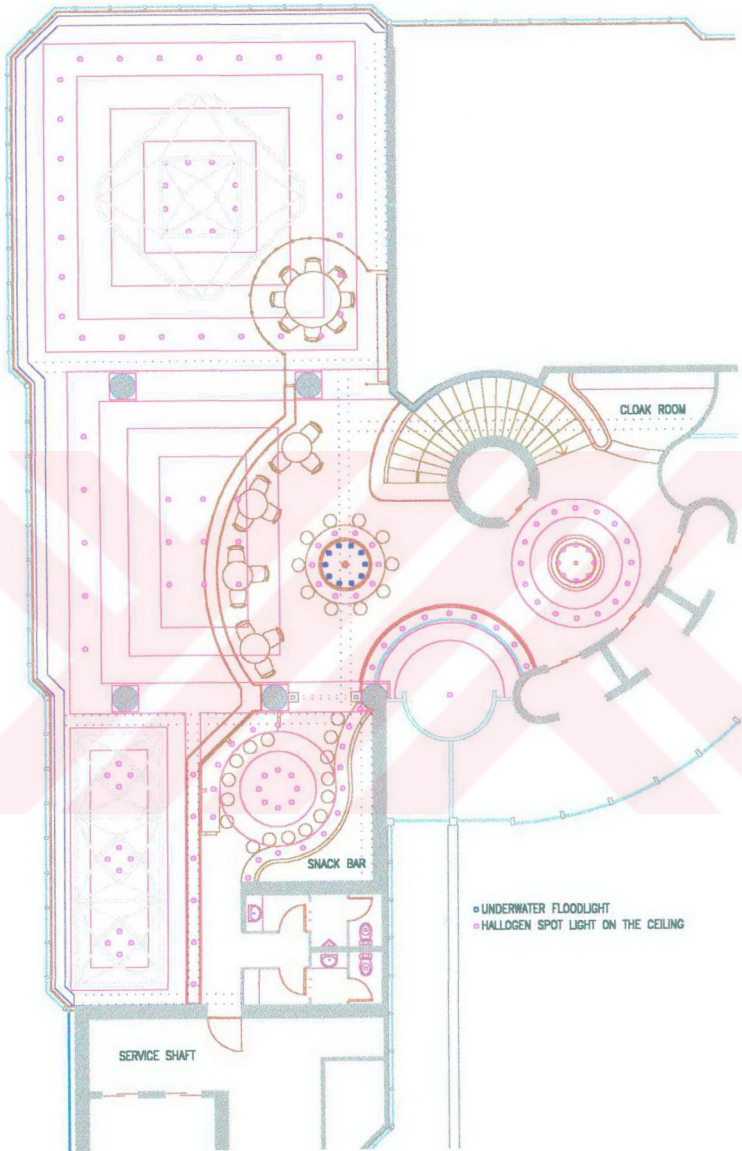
Bar level plan showing suspended ceiling, ventilation & lighting system.
